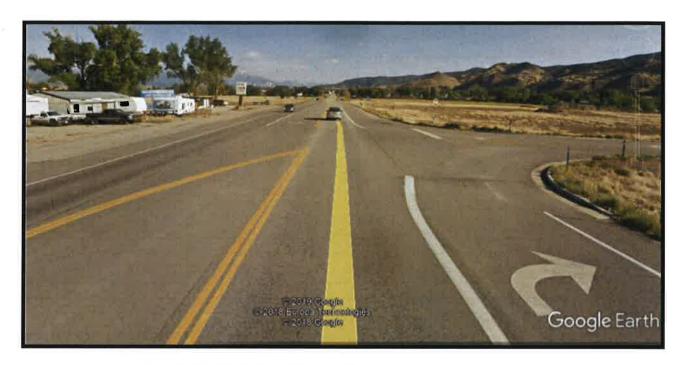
Highway 50 looking North West at Vandaveer Ranch Road
